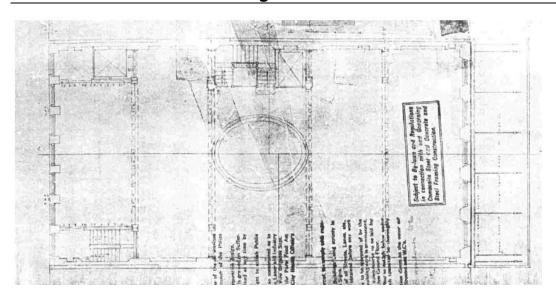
Beneficial House—First Floor Plan as documented in 1922. (Source City of Sydney Archives, BA 74/22, as presented in the Beneficial House CMP, 2004)
